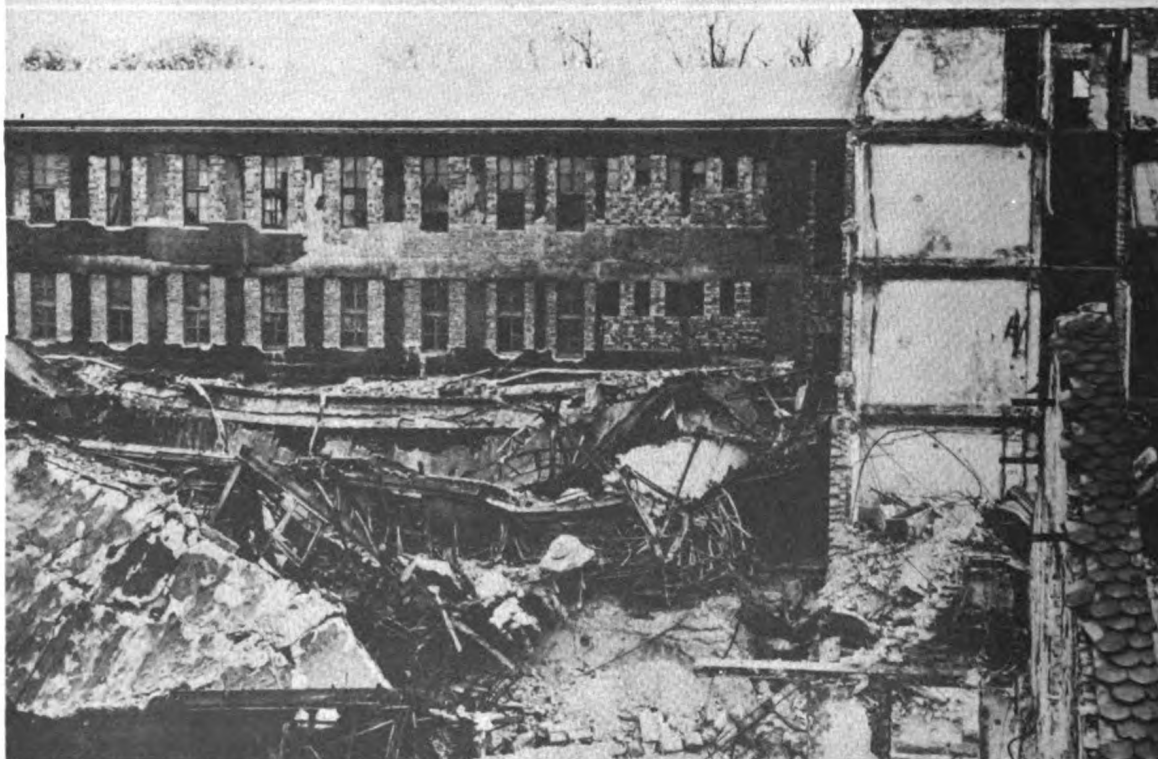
Blast damage to steel frame-monitor type skylight. Note repairs to damaged walls. Reproduction of captured photo.
